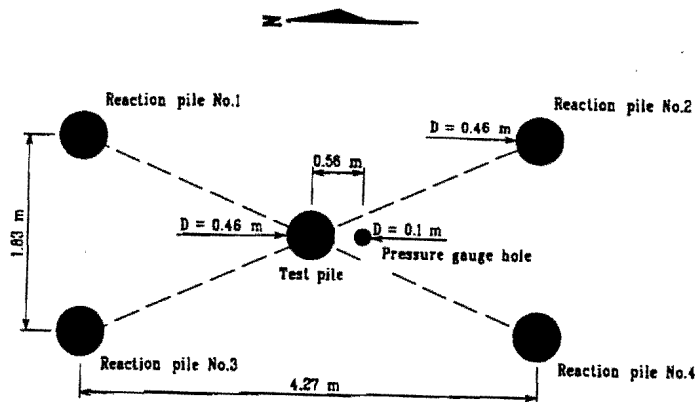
Layout of test pile and reaction piles (Rosenberg)
